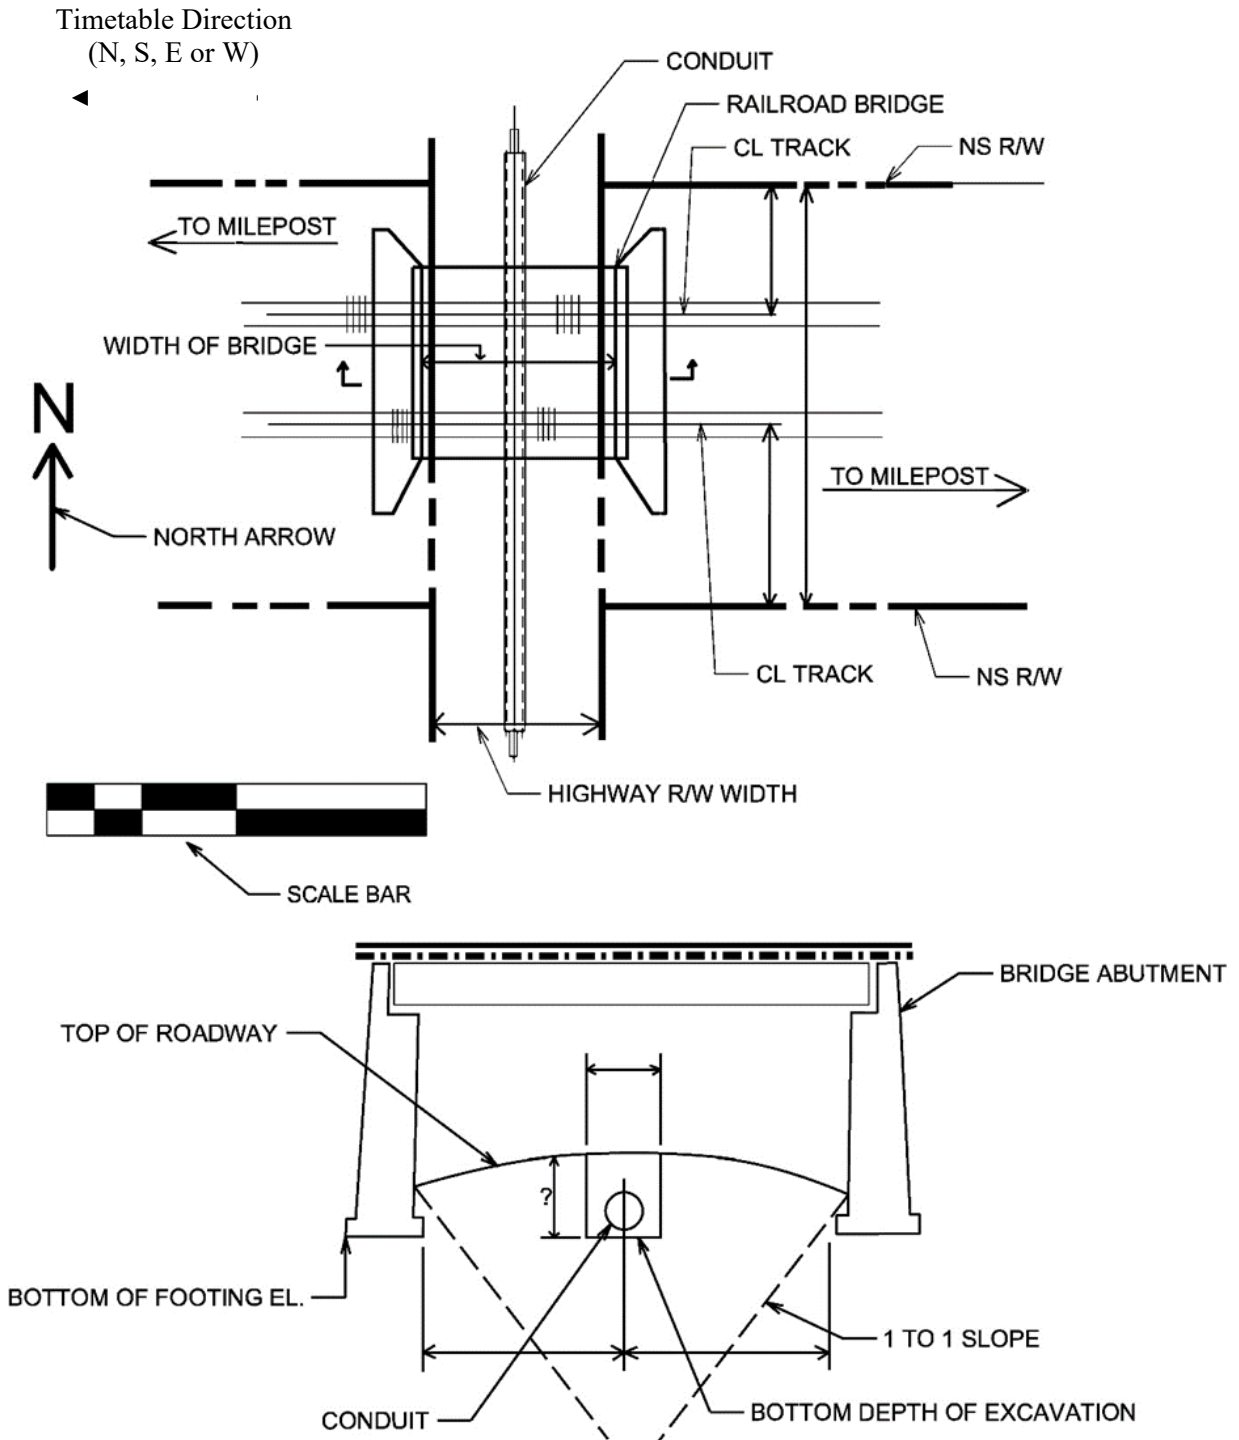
PLATE XI - Sample Conduit Profile and Section Views Pipe in Highway Over Railway
